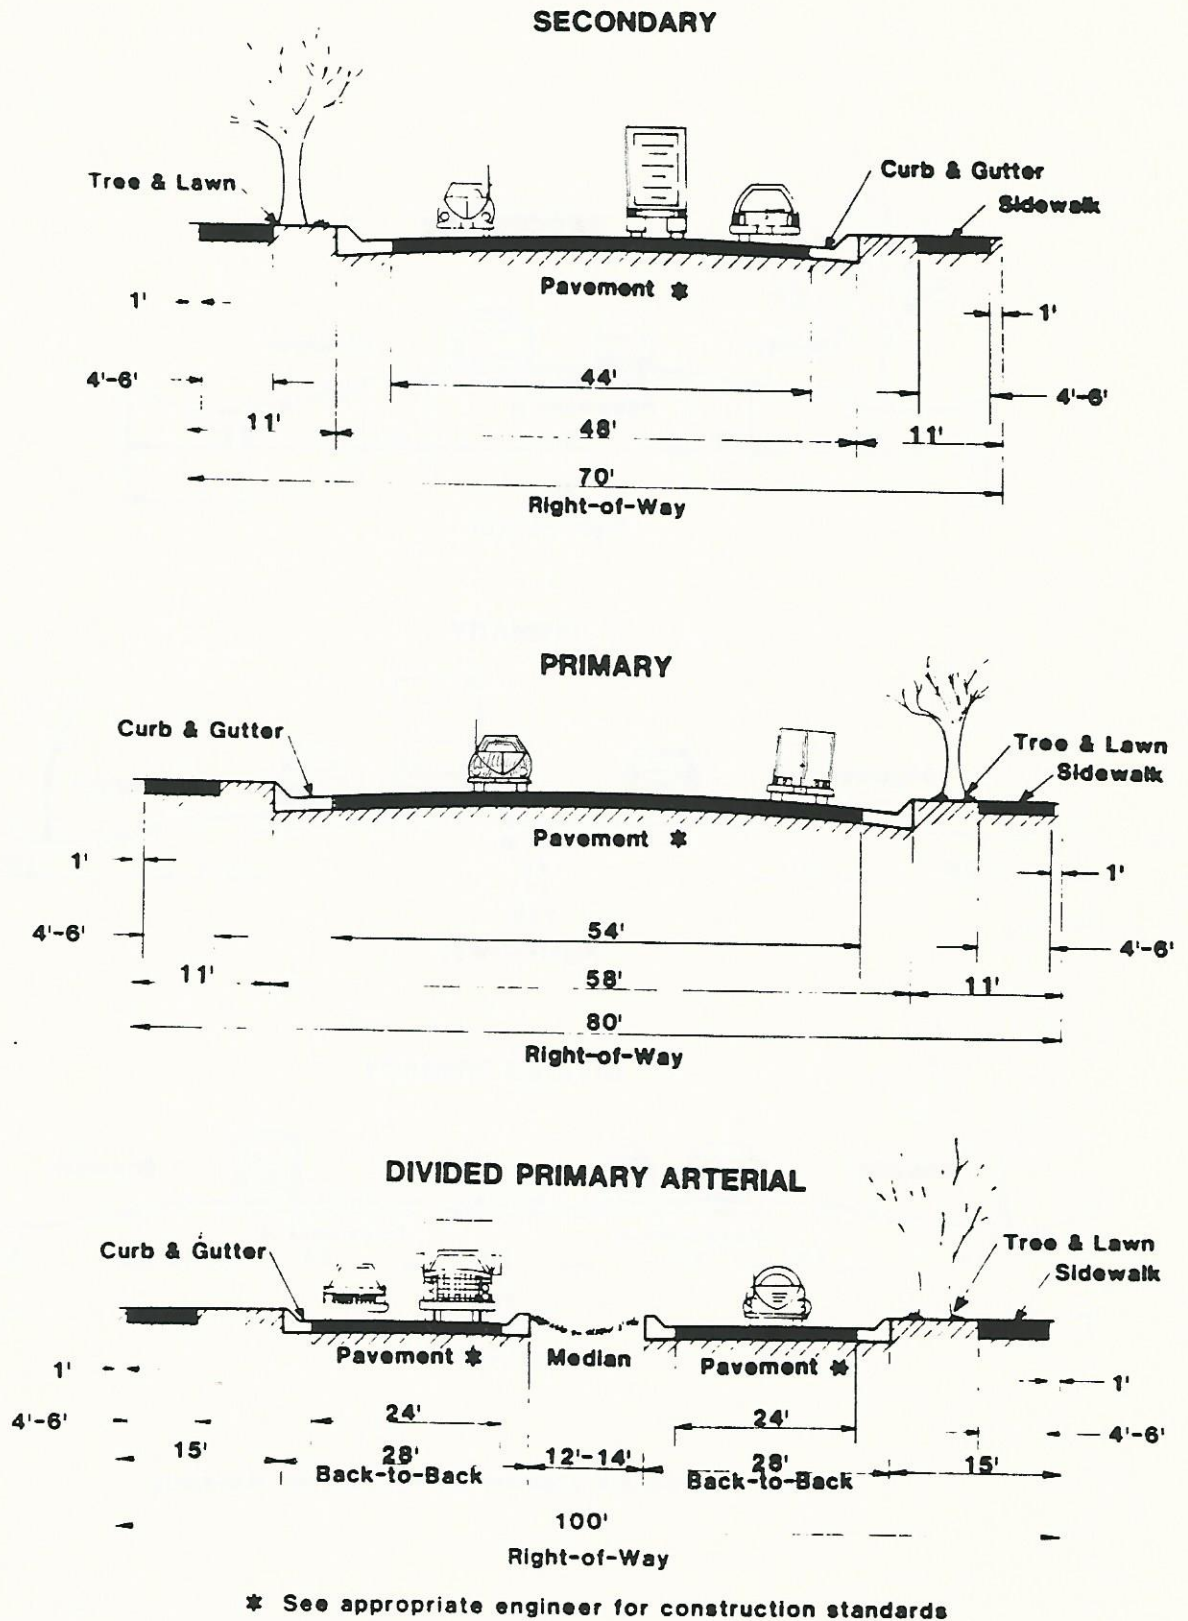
TYPICAL URBAN CROSS SECTIONS FOR MAJOR STREETS
